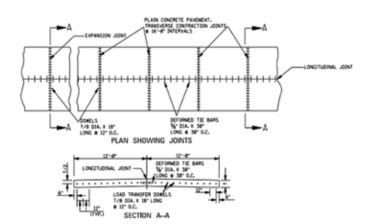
A plan view of a pavement with transverse contraction joints and a cross section of a transverse joint detail
